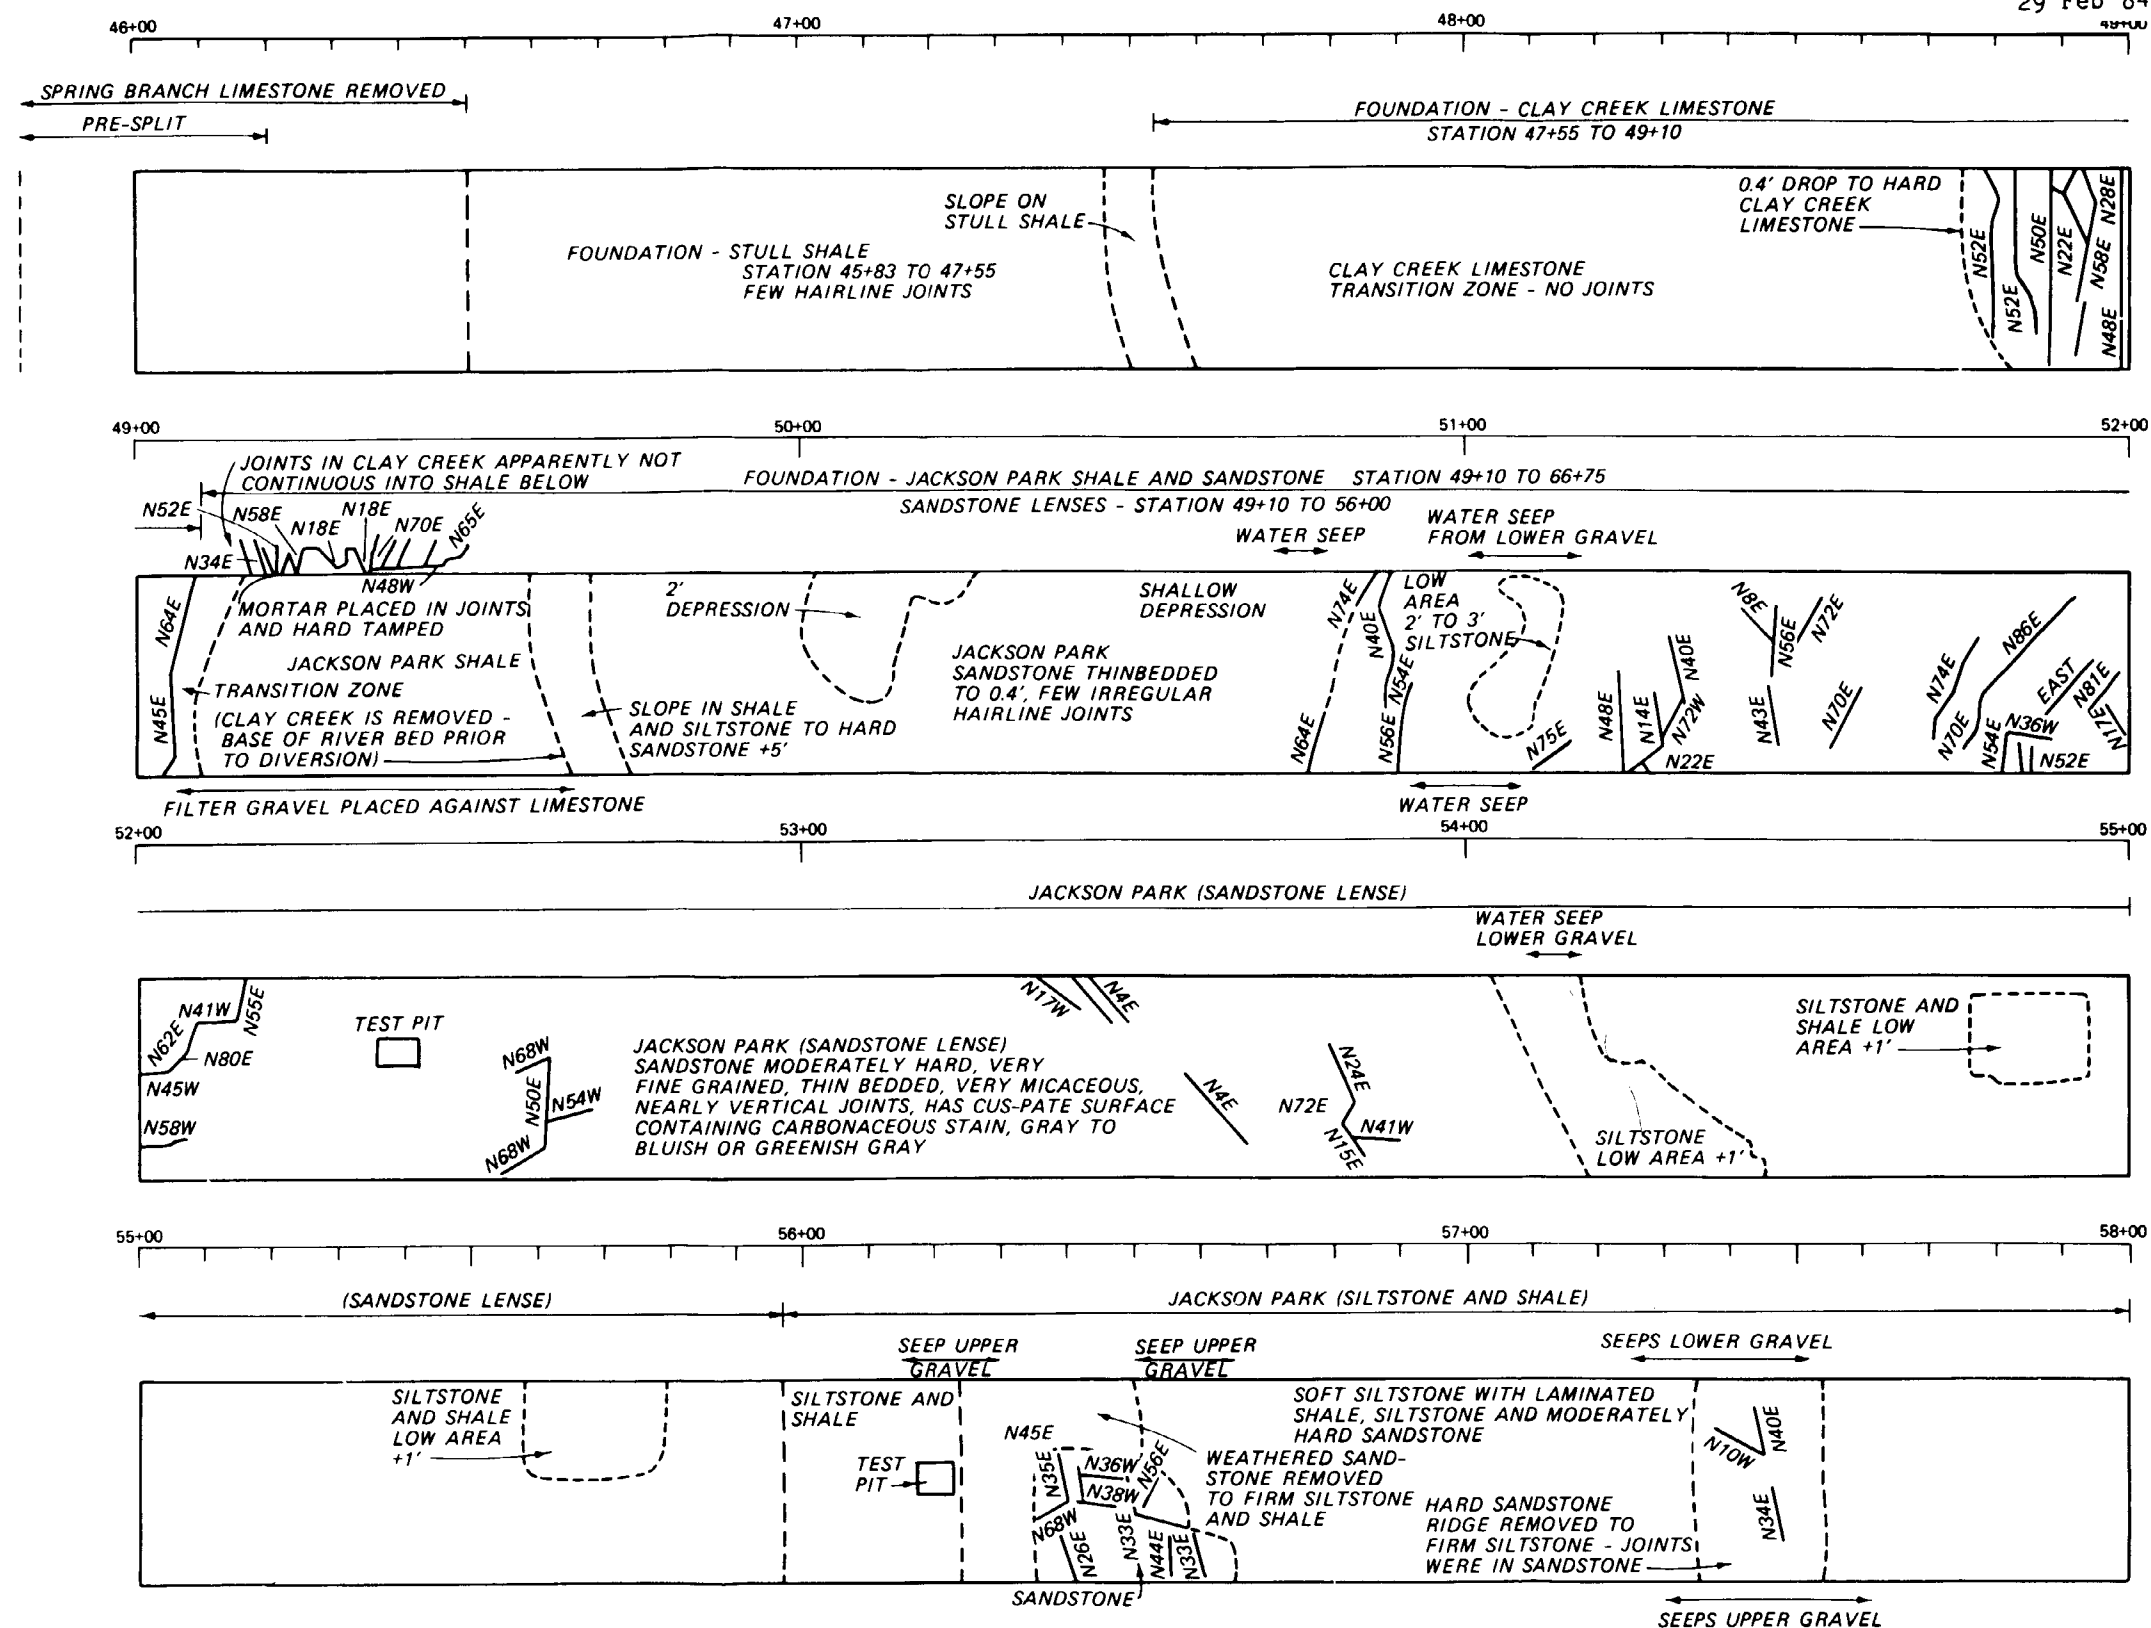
Foundation map for earth dam impervious core on sedimentary rocks
